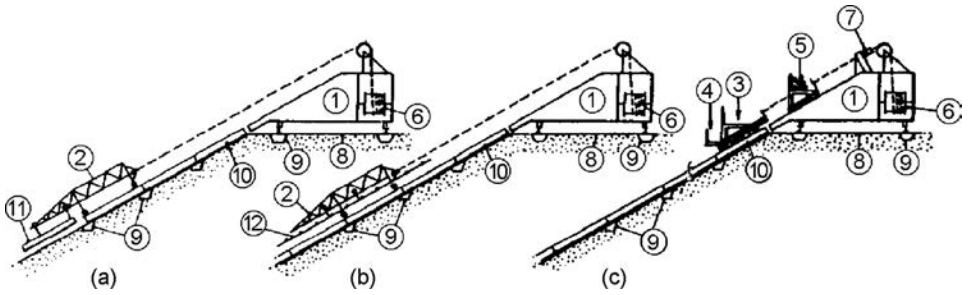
Transportation equipment for the construction of concrete facing. (a) Transportation of rails, (b) of reinforcement and (c) of slipform: (1) Rail transporter on the crest; (2) transporter for rails and reinforcement; (3) slipform; (4) working platform; (5) platform for delivery of concrete; (6) pulley for lifting; (7) hydraulic hoist; (8) crest of dam; (9) supports for rails; (10) mounted rails; (11) rails for slipform; (12) fit-up reinforcement mesh.
